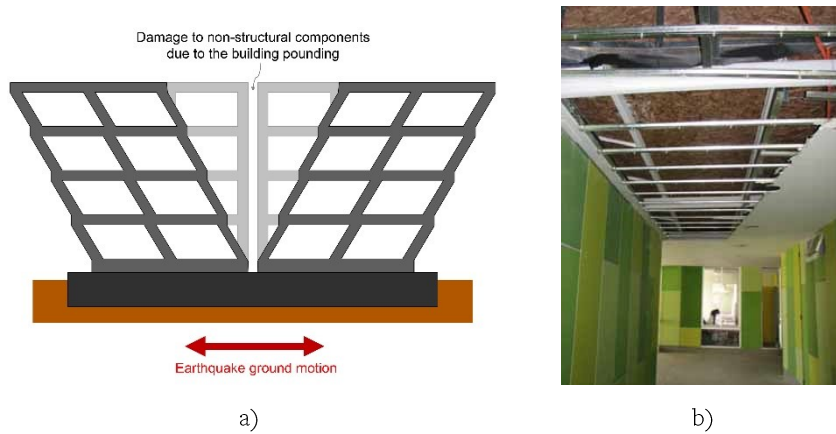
Effects of the building pounding on non-structural components and systems: a) An example of non-structural damage; b) Damage to a suspended lightweight steel gypsum board ceiling due to the pounding at the interface between two service blocks, Terraustral Del Sol High School, 2010 Chile Earthquake (photo courtesy by Knauf Chile)
